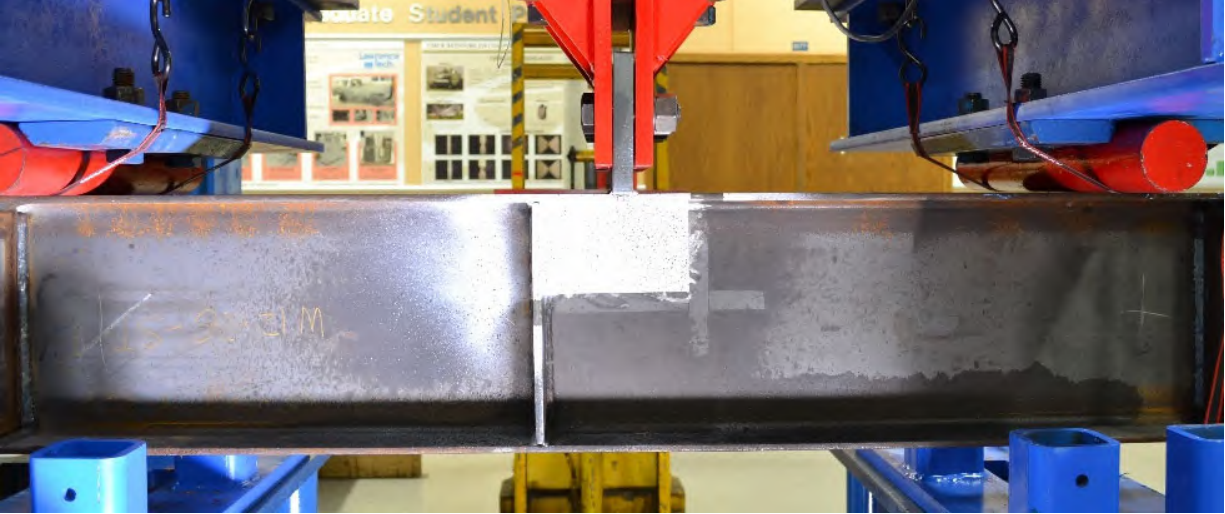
Side view of W12X26-ST-NA after testing emphasizing flange bending
